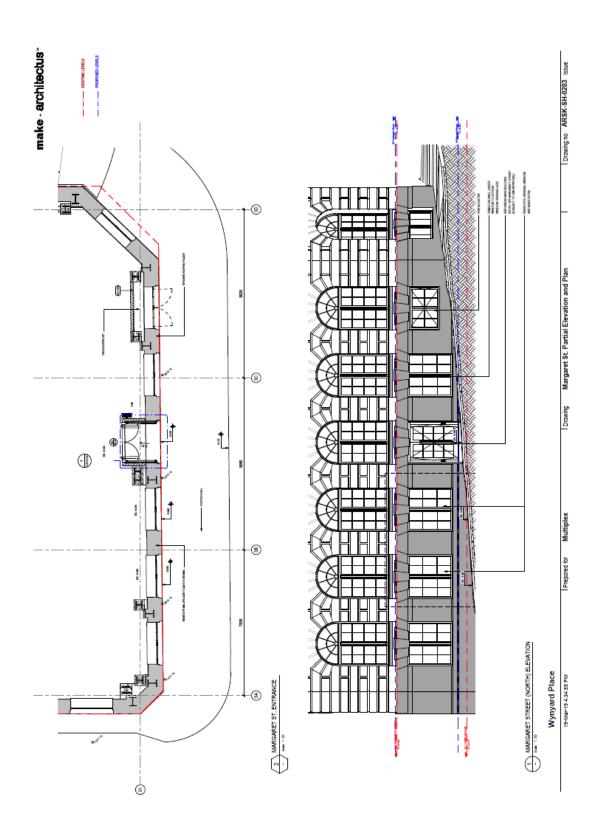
Proposed Shell House Plan and Elevation—showing levels and details of proposed new changes to the Margaret Street (North) Elevation. (Source: Make + Architectus, ARSK-SH-0203, 19 March 2019)
